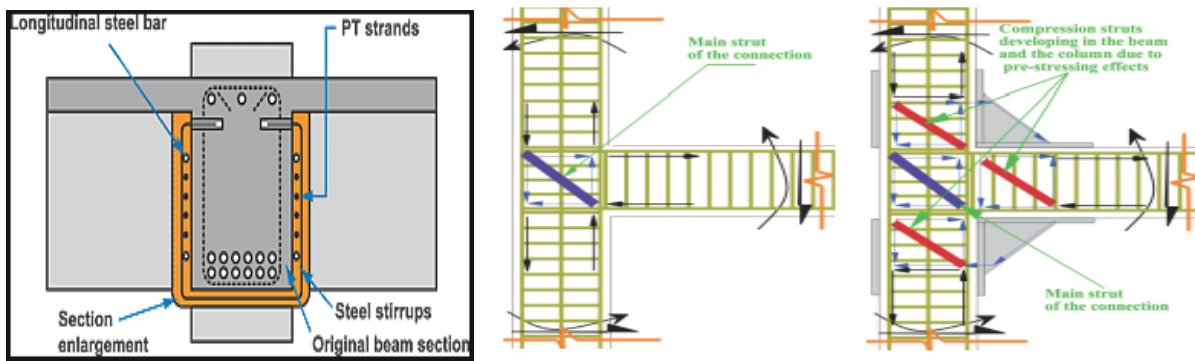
Strengthening scheme examples: a) Section Enlargement, b) Concrete Jacketing at Beam Column Joint
